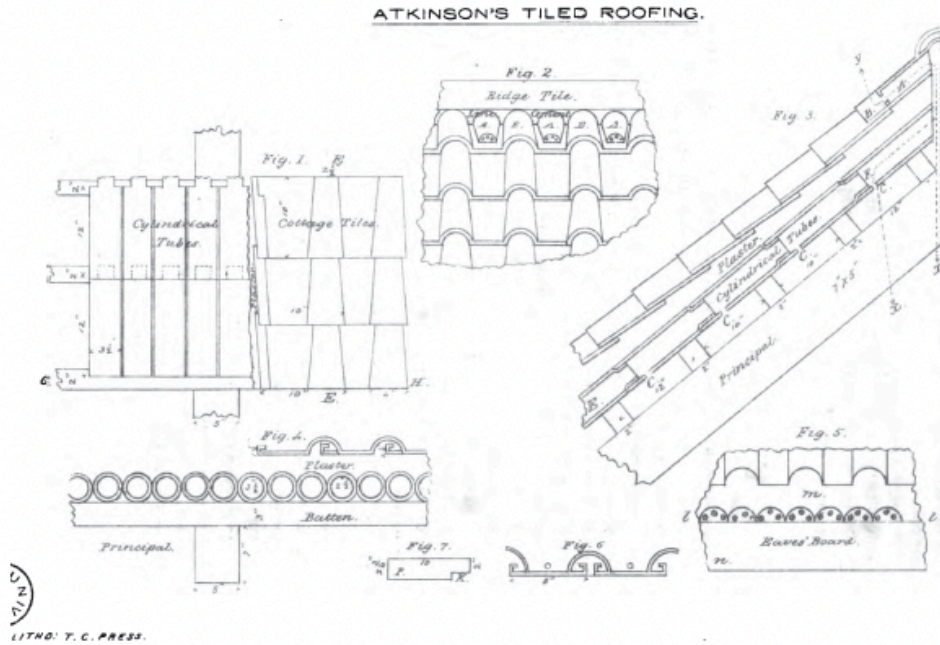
The Atkinson tile roofing drawings that were first published in 1864 (Source: Peile, 1864 p490).
